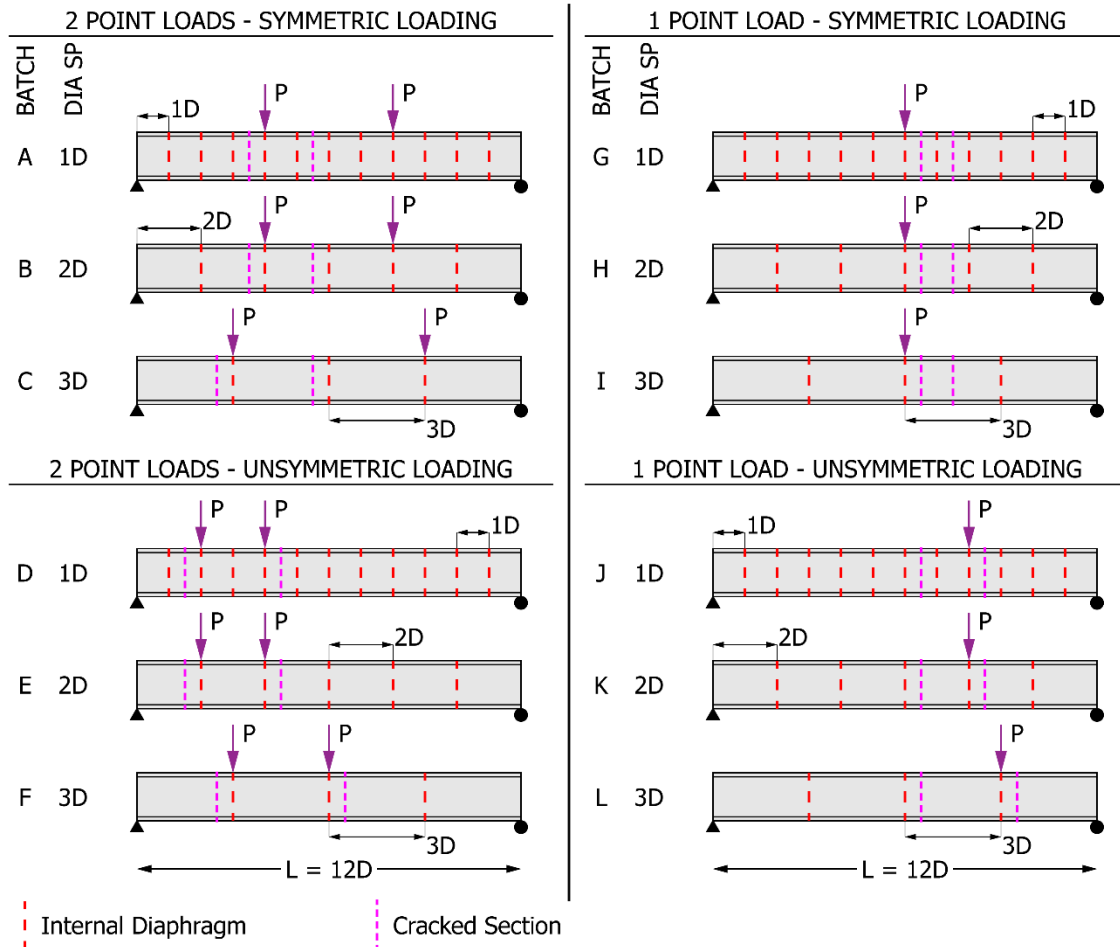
Design Concept B parametric FE study: loading conditions and crack locations
